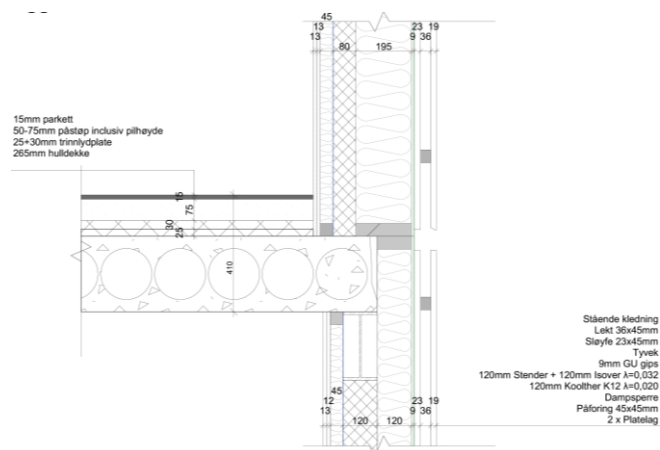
SHOWING WALL AND FLOOR DETAILS (ARCA NOVA)
